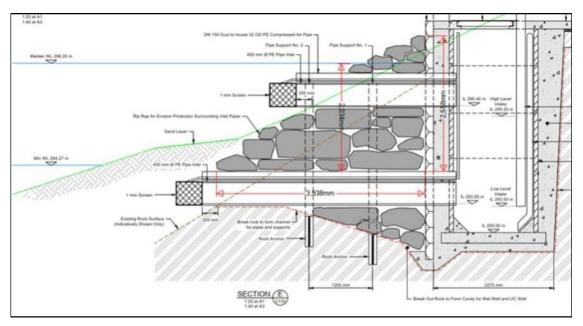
Section of the water intake and station, showing the deepest extent of rip rap to protect the intakes.
